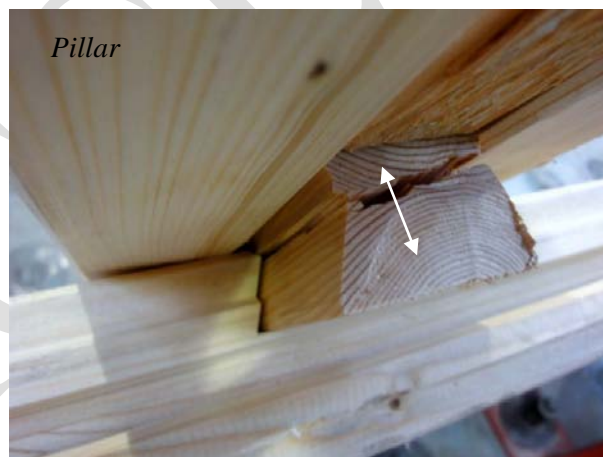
Collapse mechanism of specimen W05. Details of failure mechanism in the rounded dovetails.
